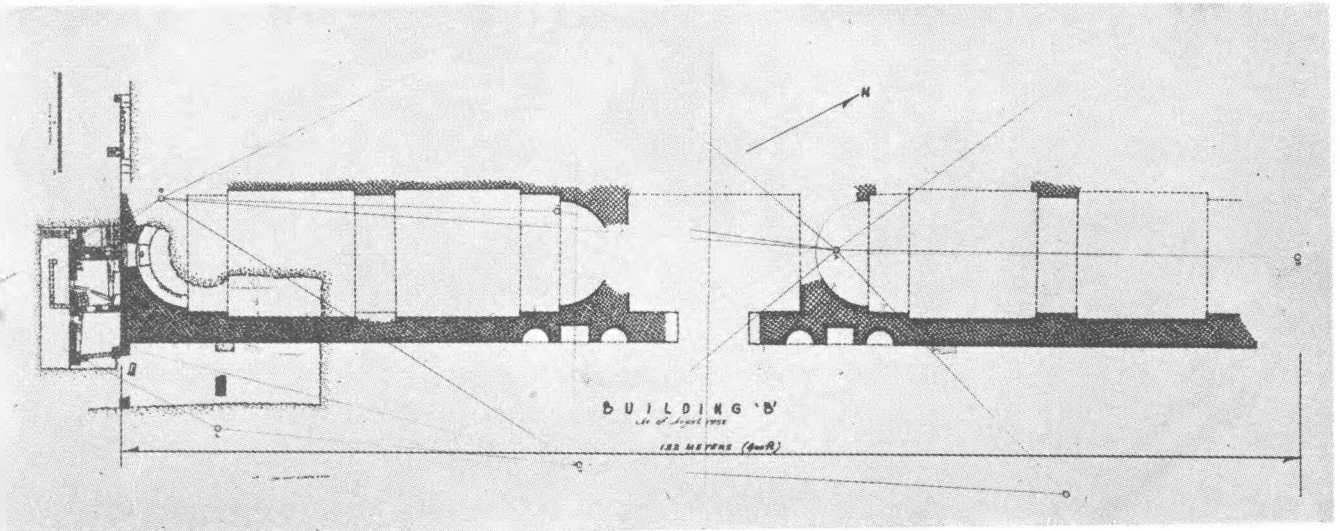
Building "B", plan of entire structure. By T. H. Canfield
